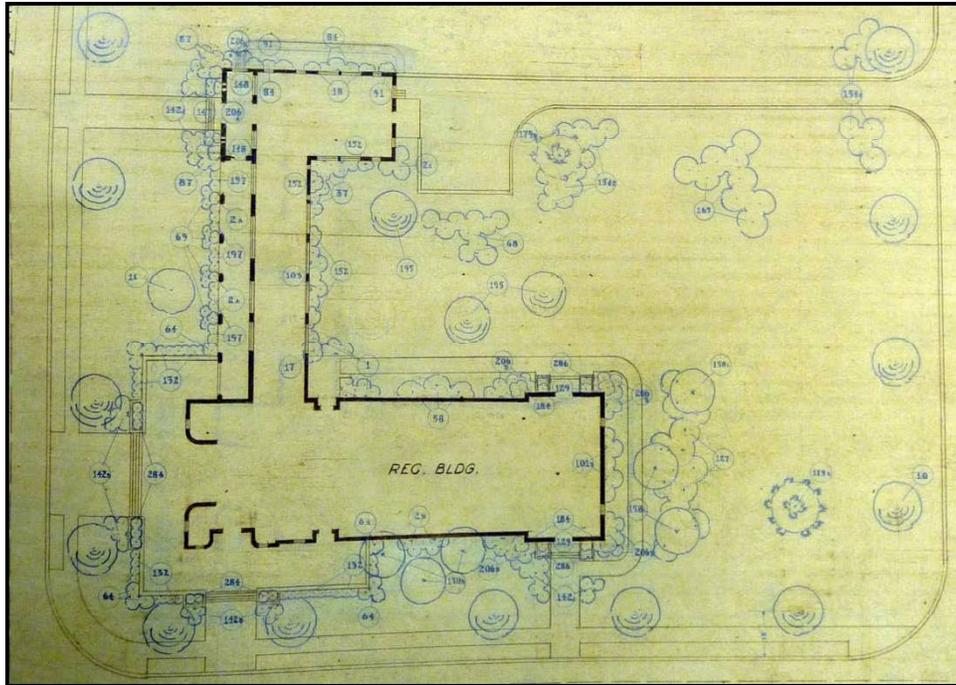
Building 1 from 1941 planting plan. Note tree lined streets and foundation shrubbery.<sup>72</sup>
